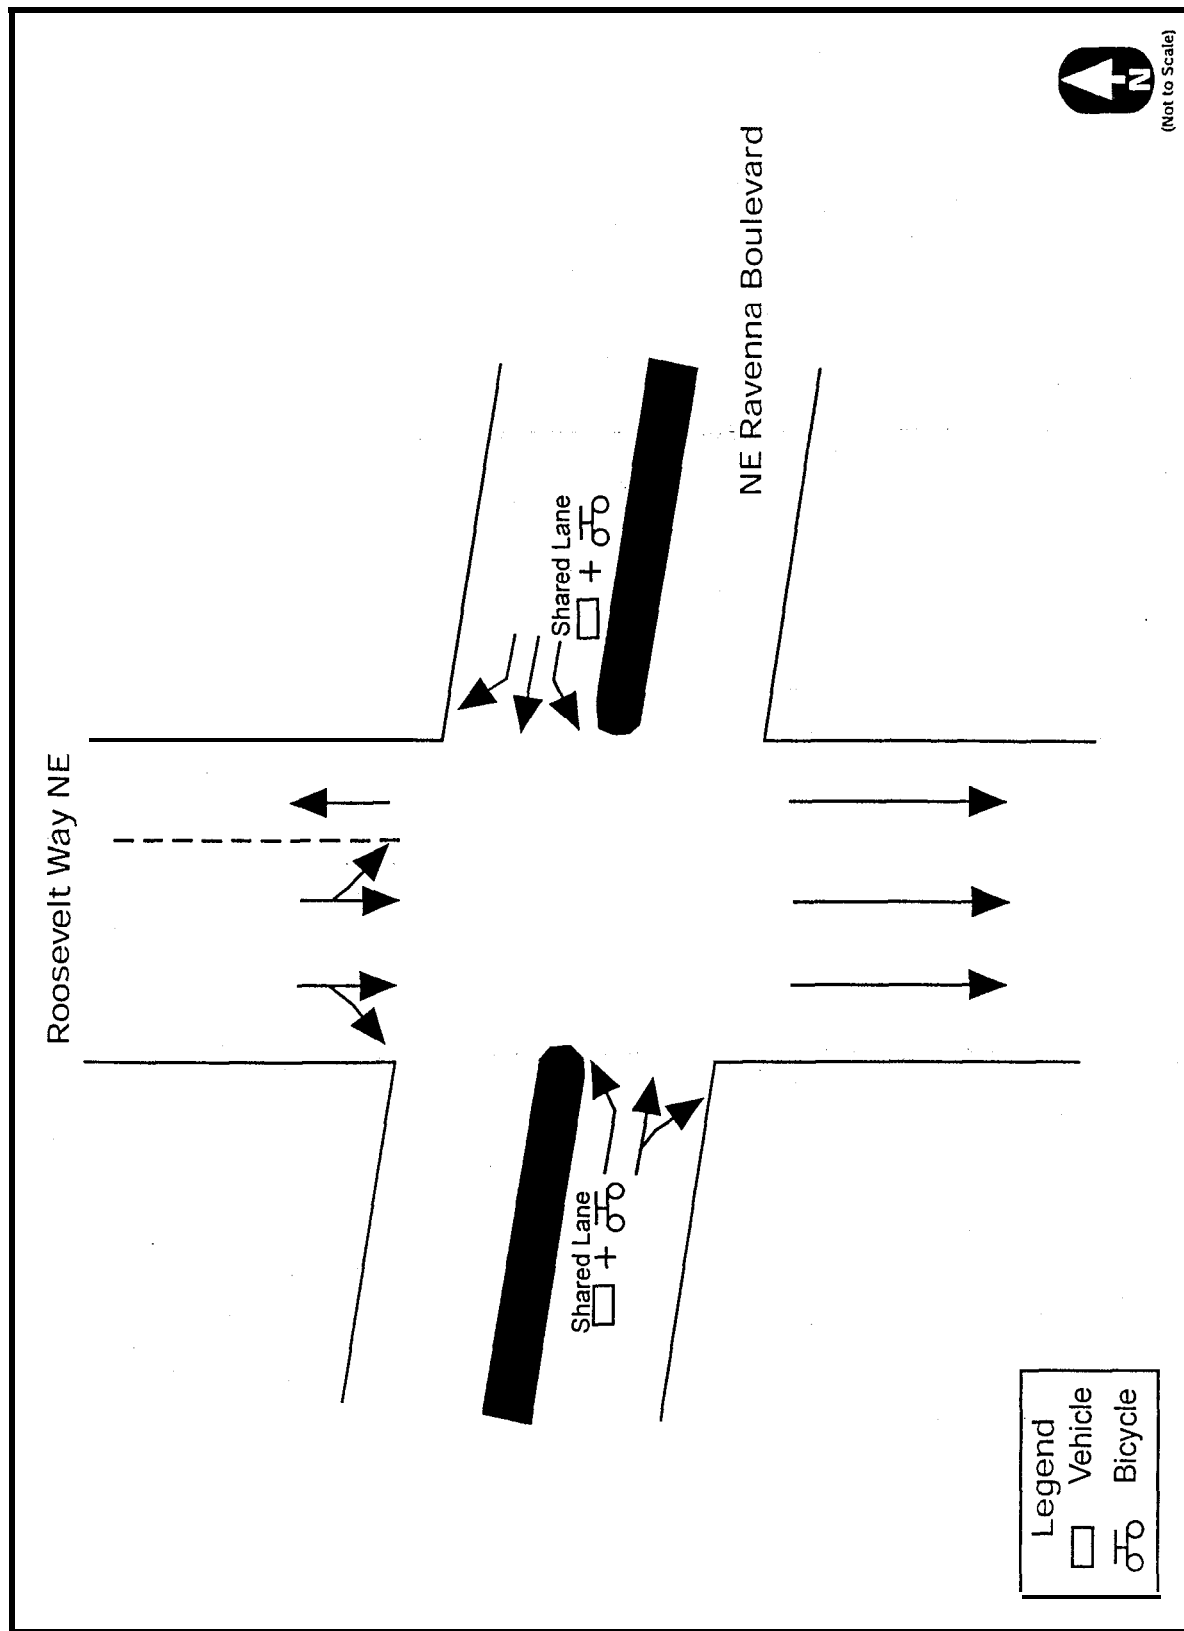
Roosevelt Way NE/NE Ravenna Boulevard Configuration
